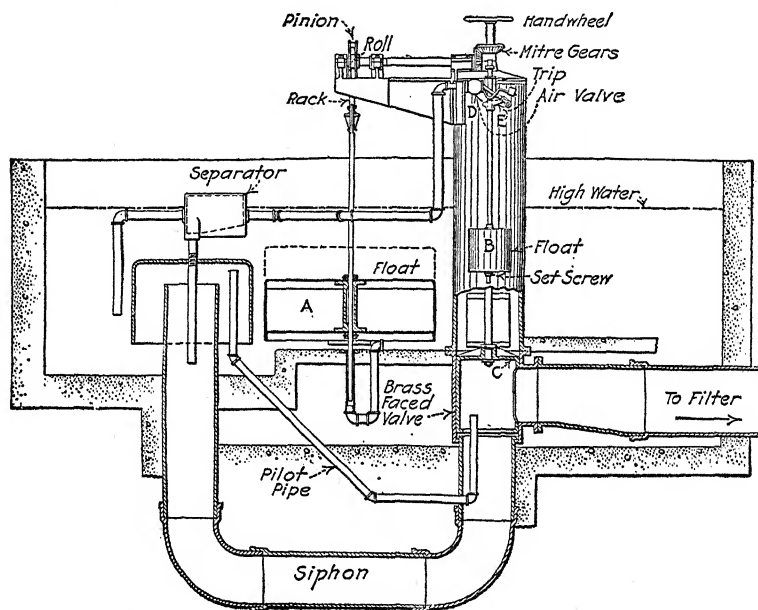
Sectional elevation of Barbour dosing apparatus at North Attleborough, Mass.
